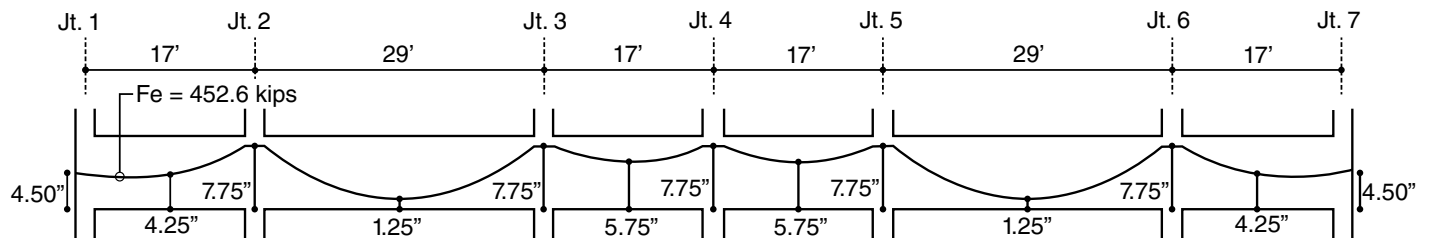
Draped strands can provide constructability solutions for transfer girders. Define strand drapes by providing dimensions from the soffit to the strand center of gravity at each support and at midspan of each span. (Image courtesy of PTI.)
